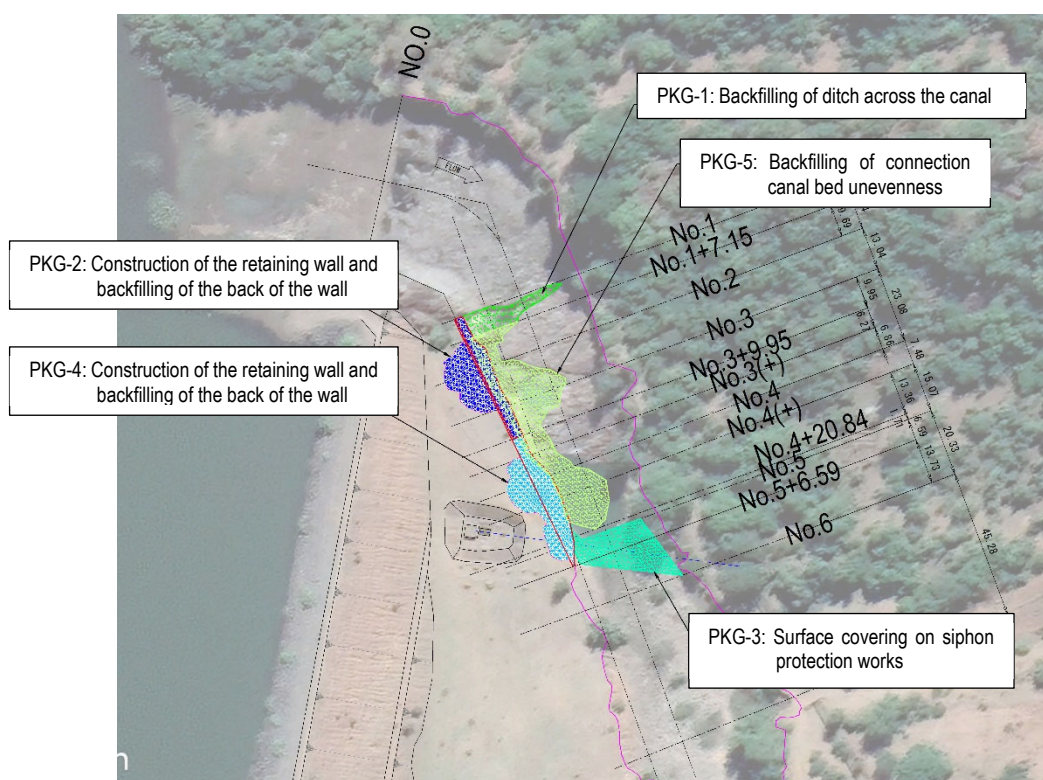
Construction Package Division of Emergency Repairing Measures
